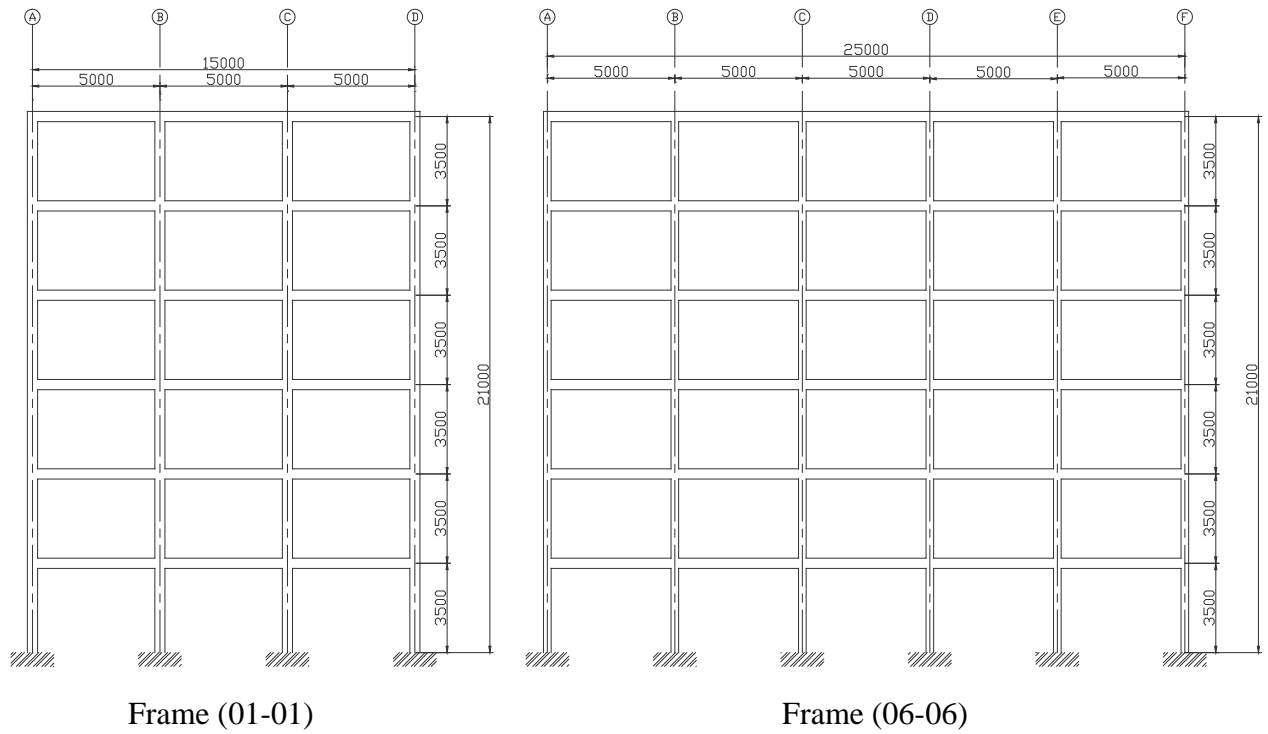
Frame (01-01) and (06-06) of six-story irregular RC building in z-direction (all dimensions are in mm)
